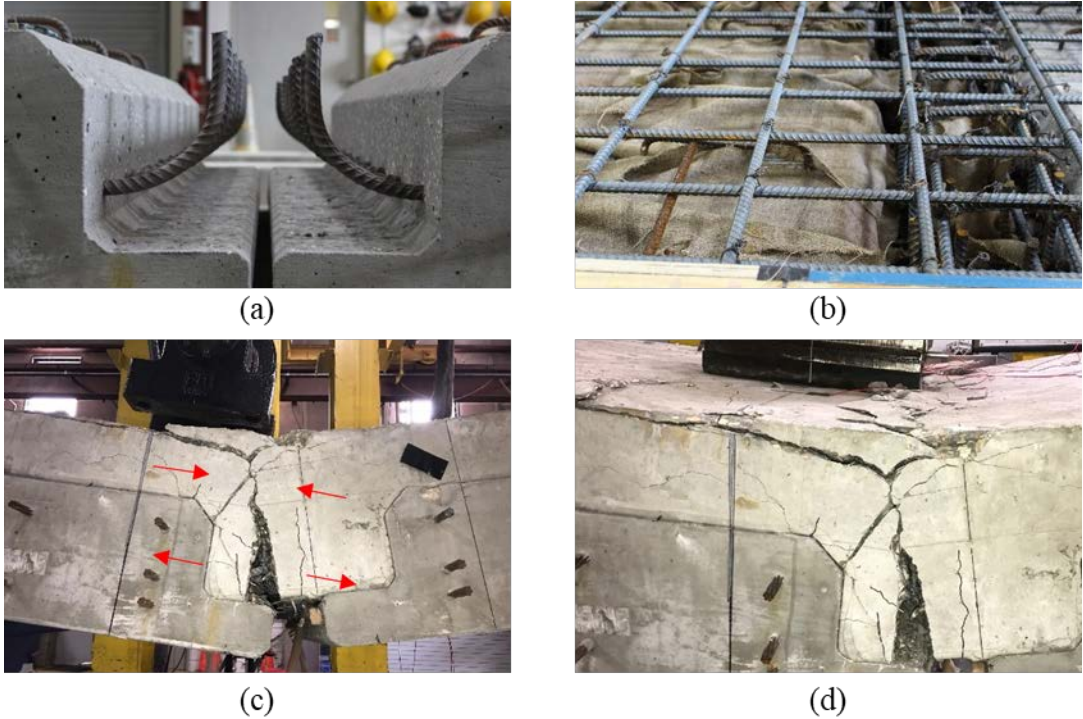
FSB-1: (a) transverse joint reinforcement, (b) full joint and deck reinforcement before casting, (c) side view of failure, and (d) top view of failure
